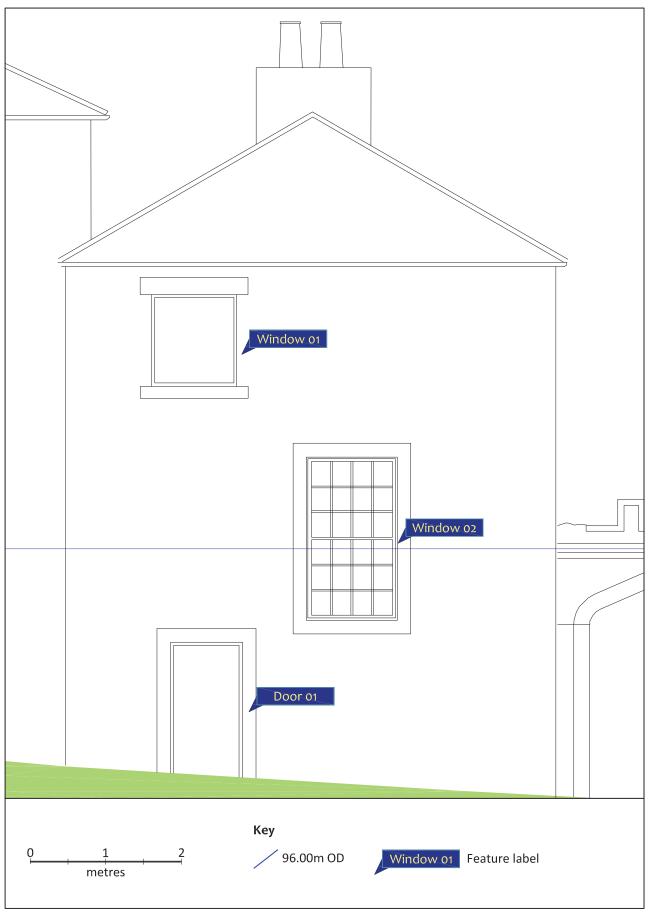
Northern elevation, after Jane Darbyshire & David Kendall Architects
